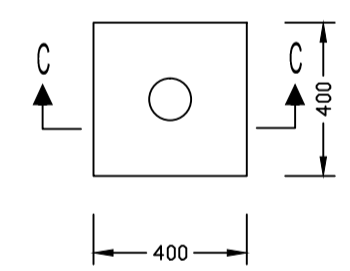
G: PLAN FOR FOOTING OF STANDARD POLE
